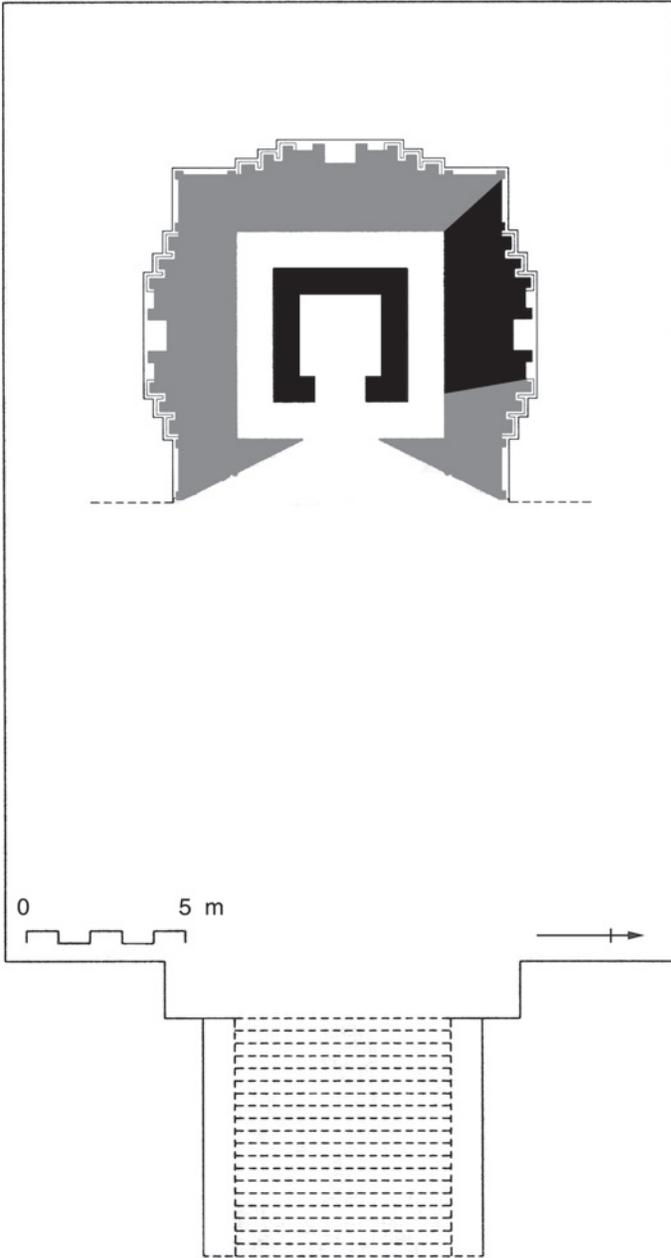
Māri-Indus, Temple C, reconstruction of ground plan.
